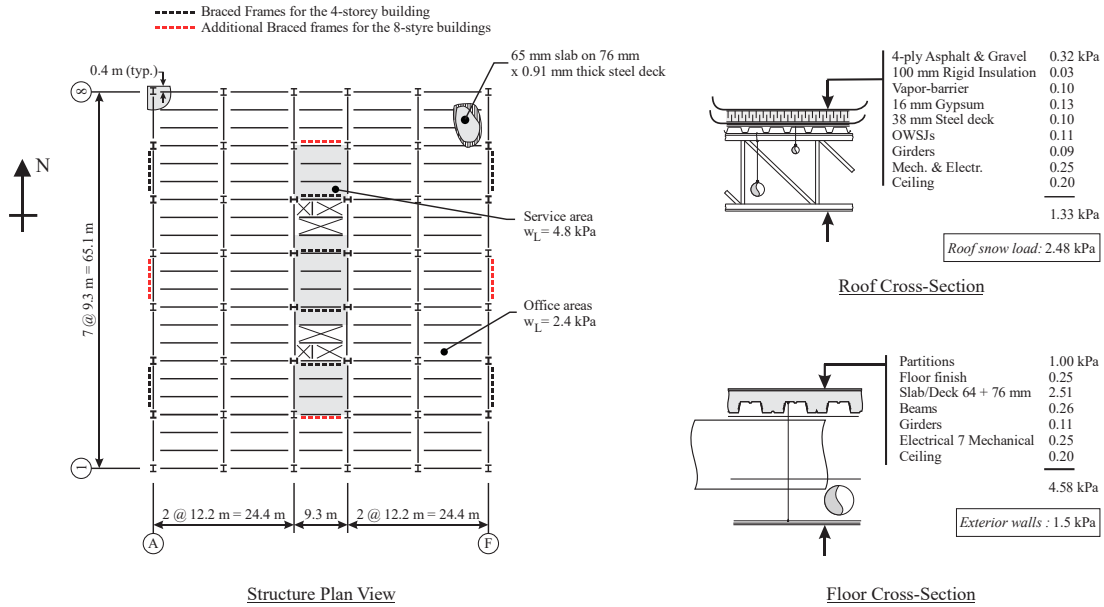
Structure plan view and design gravity loads of the buildings studied.
